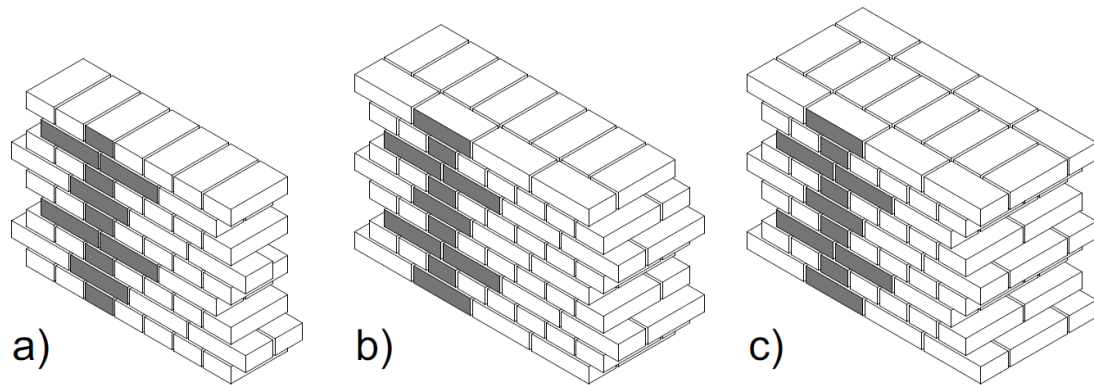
Cross bond: a) one-brick wall, b) alf-and one-brick wall, c) two-brick wall
